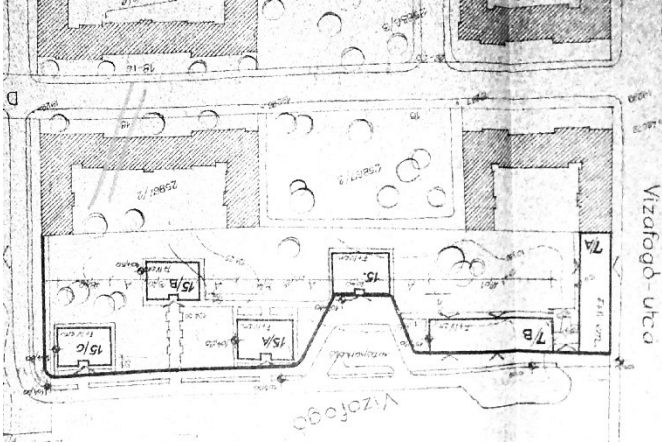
Master plan of the Népfürdő Street small HE from 1959. (Source: BUVÁTI, 1959)
